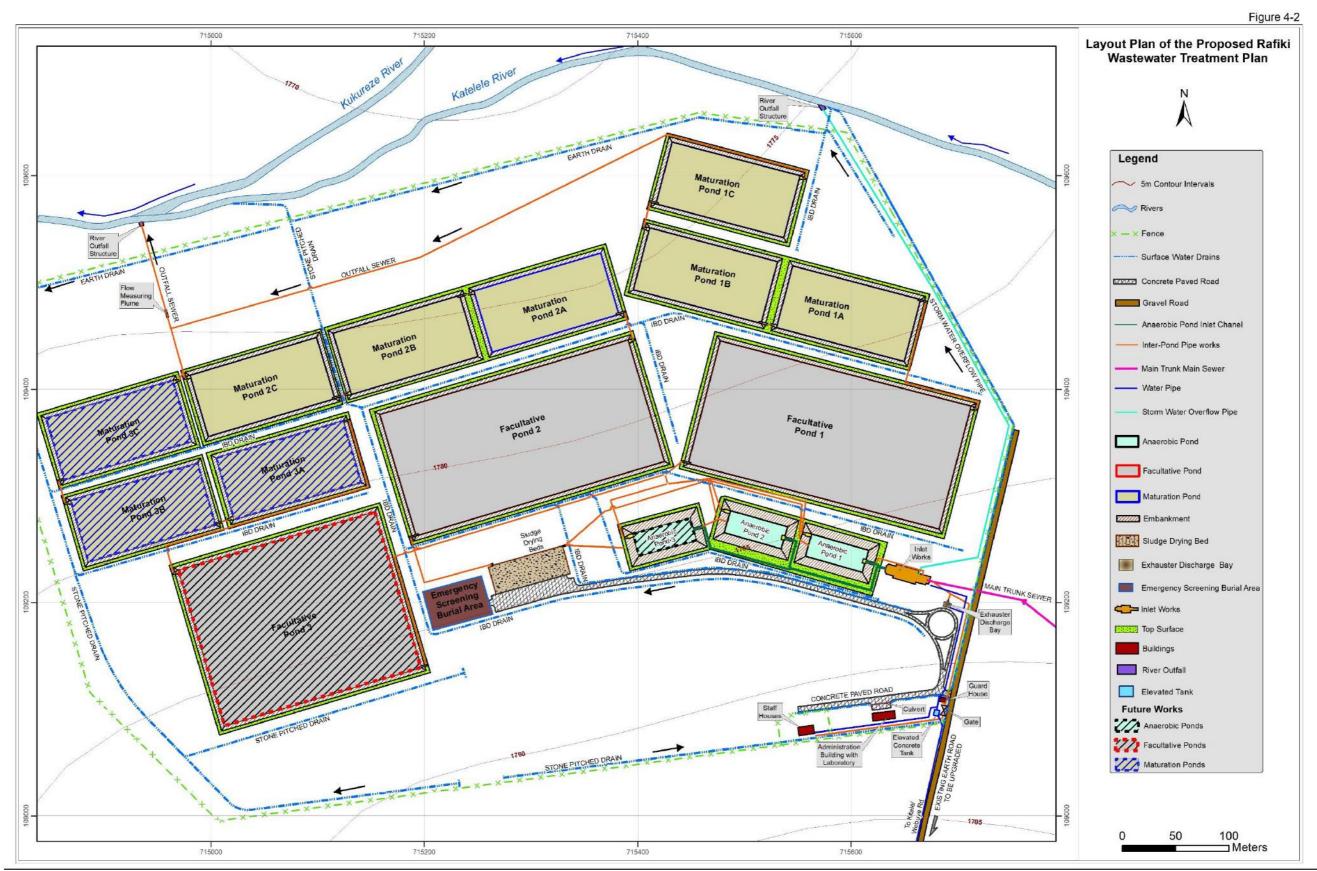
A Layout Plan of the proposed Rafiki WWTP
